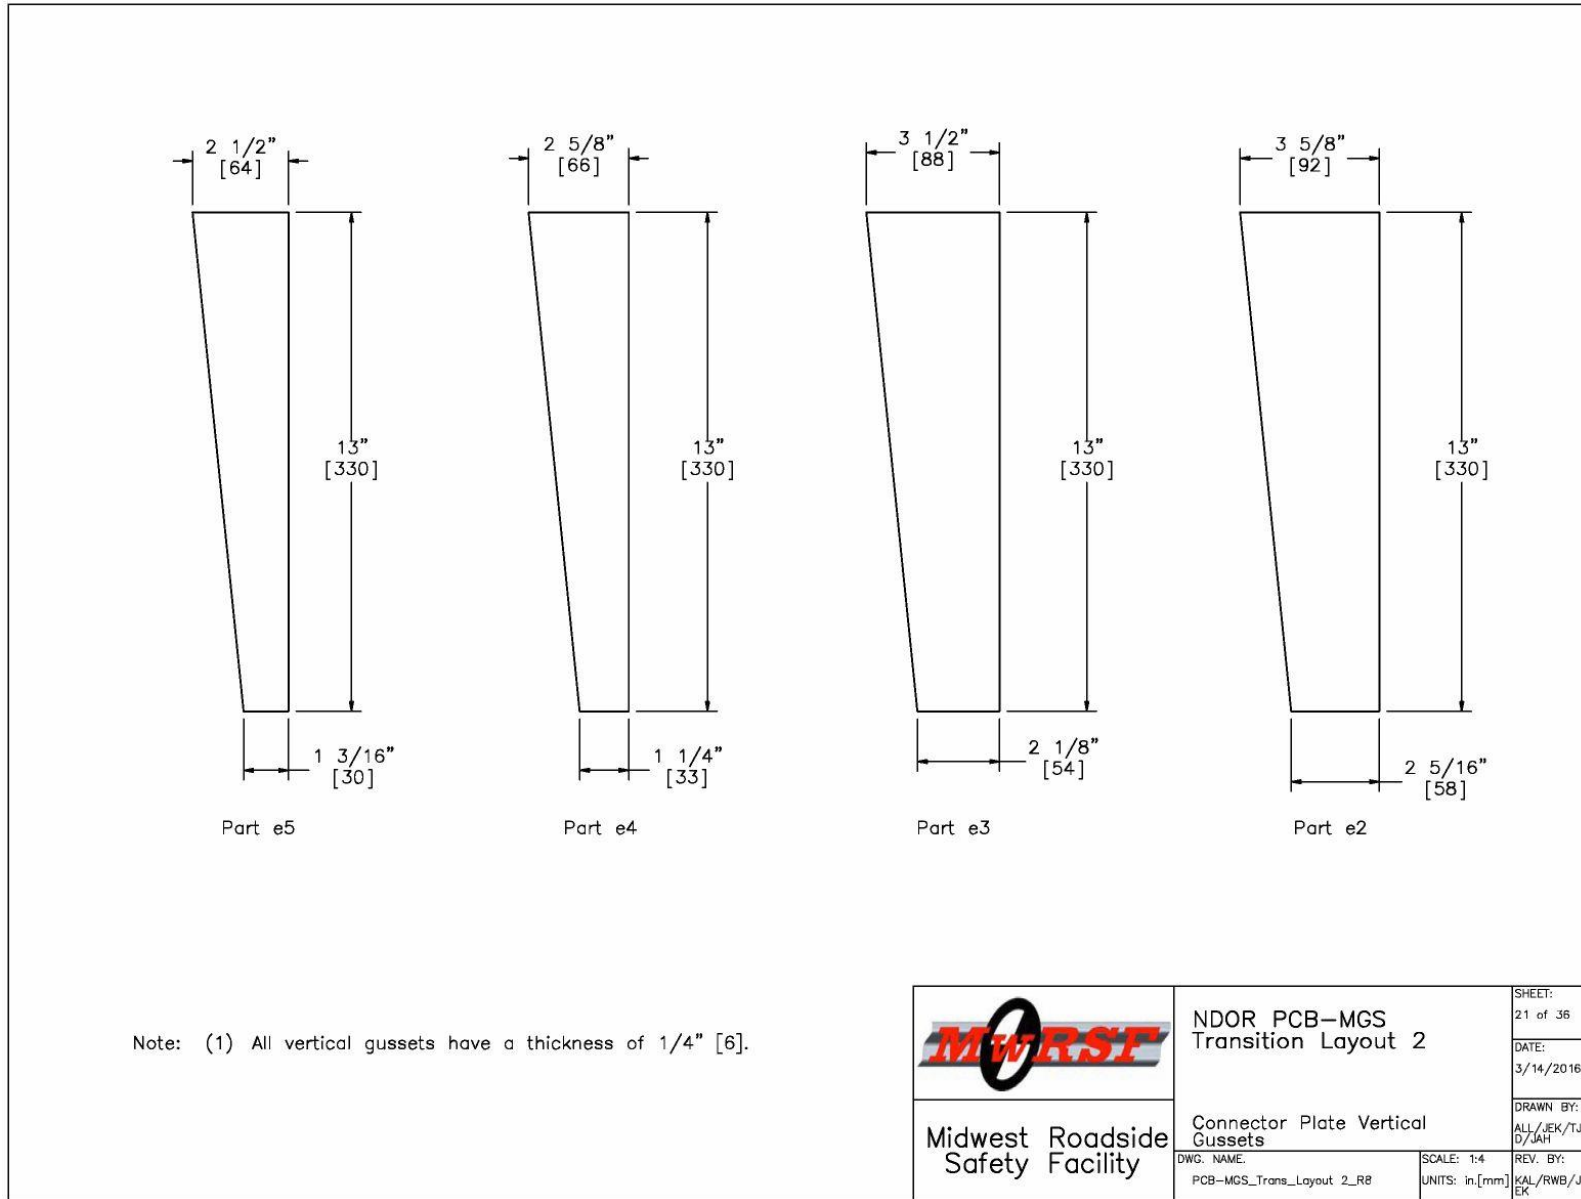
Connector Plate Vertical Gussets, Test No. MGSPCB-1
